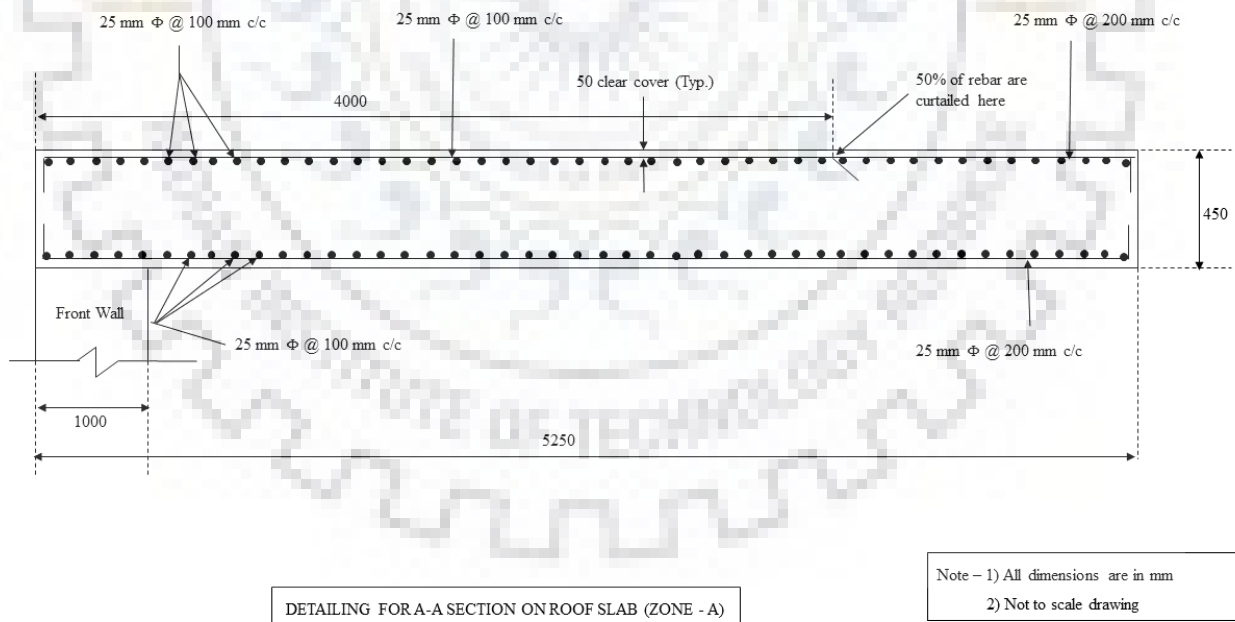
Detailing of Section A-A of roof slab for zone - A
